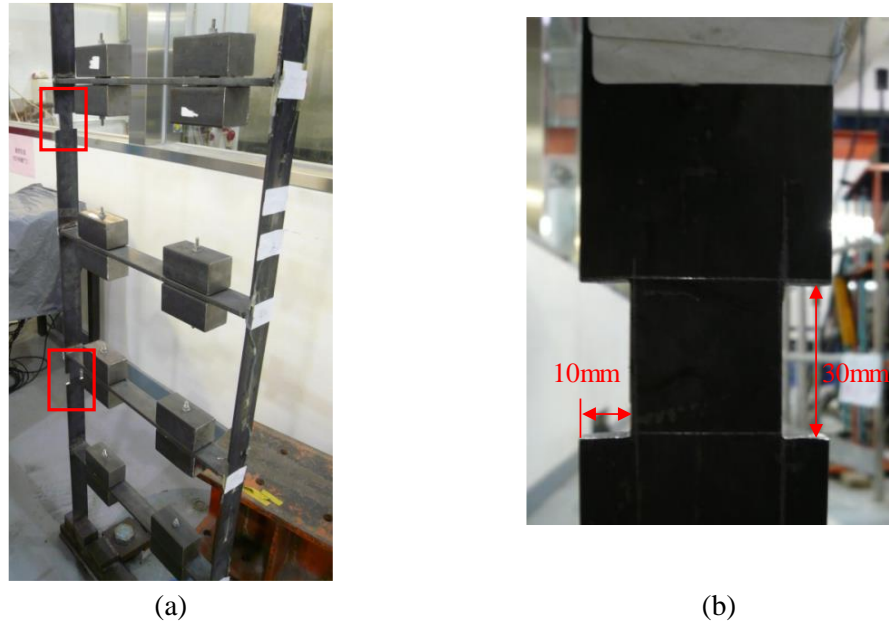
(a) Frame structure with damage; (b) Detail of the damaged element.
